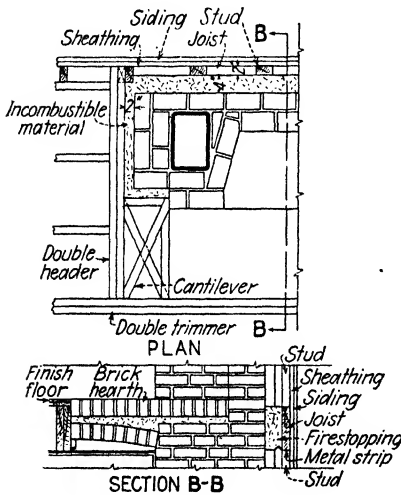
Protection around fireplace in outside frame wall and section showing trimmer arch and hearth.
